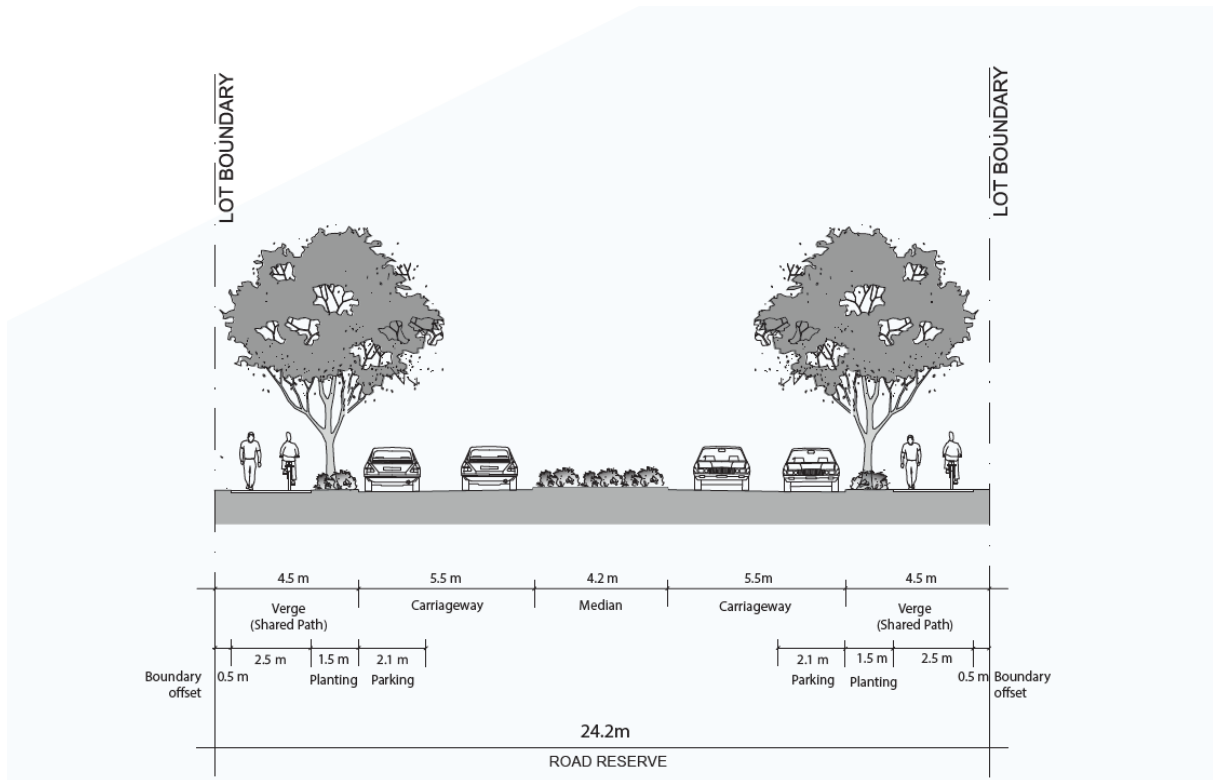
Boulevard Road (Local Road) - cross-section (Source: Design + Planning)
